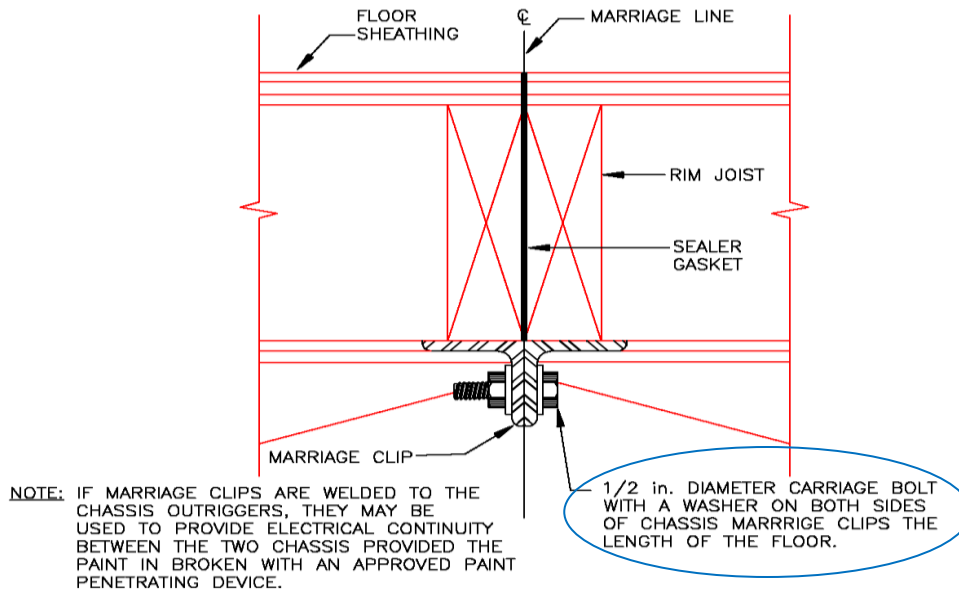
(c) Typical Marriage Line Interior Wall Connection
